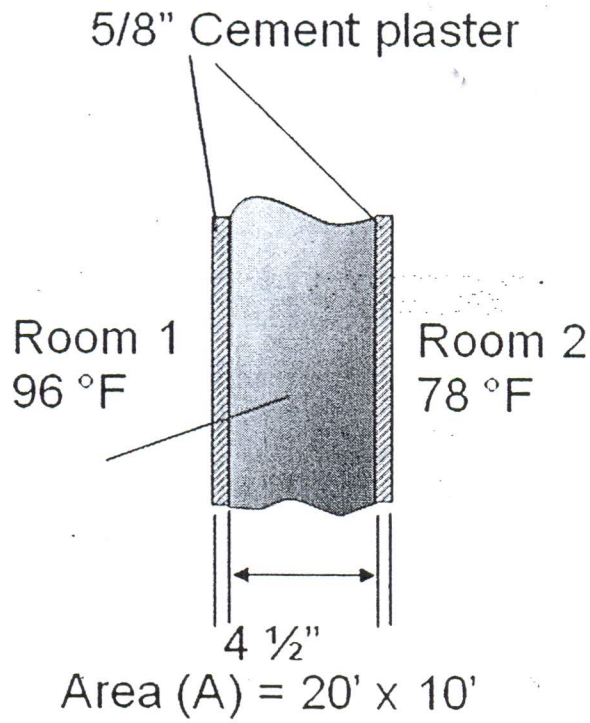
The diagram above shows a wall construction of an office building. Find the heat loss, Q.
